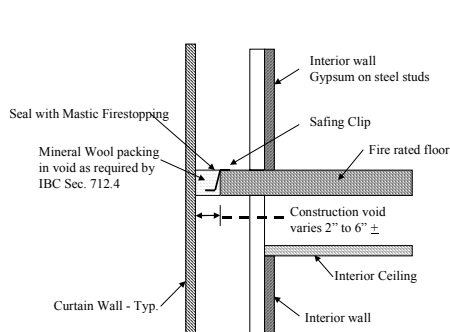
Exterior Curtain Wall/Floor Intersection with interior wall
